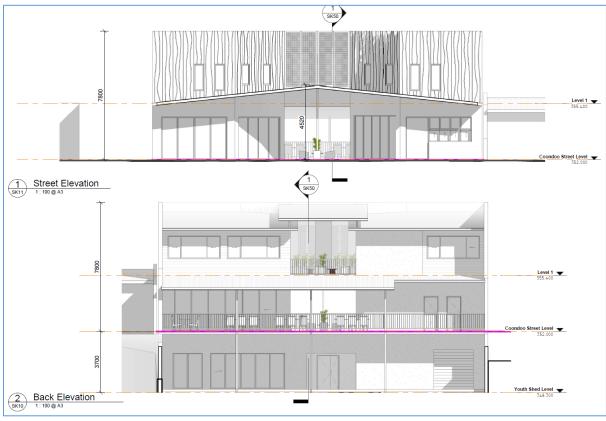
FRONT AND REAR ELEVATIONS (PRIMARY BUILDING)
